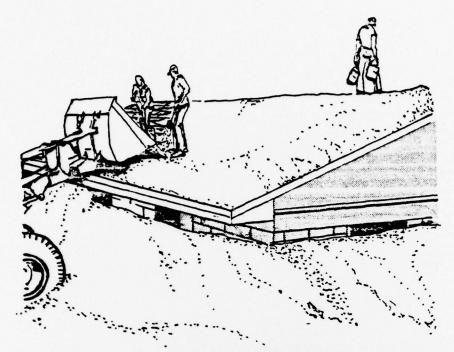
PLACING SOIL ON SLOPED ROOF.
